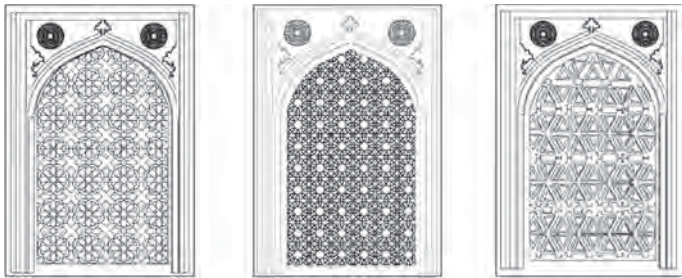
Details of intricate jali works on the walls of Chhoti Dargah
